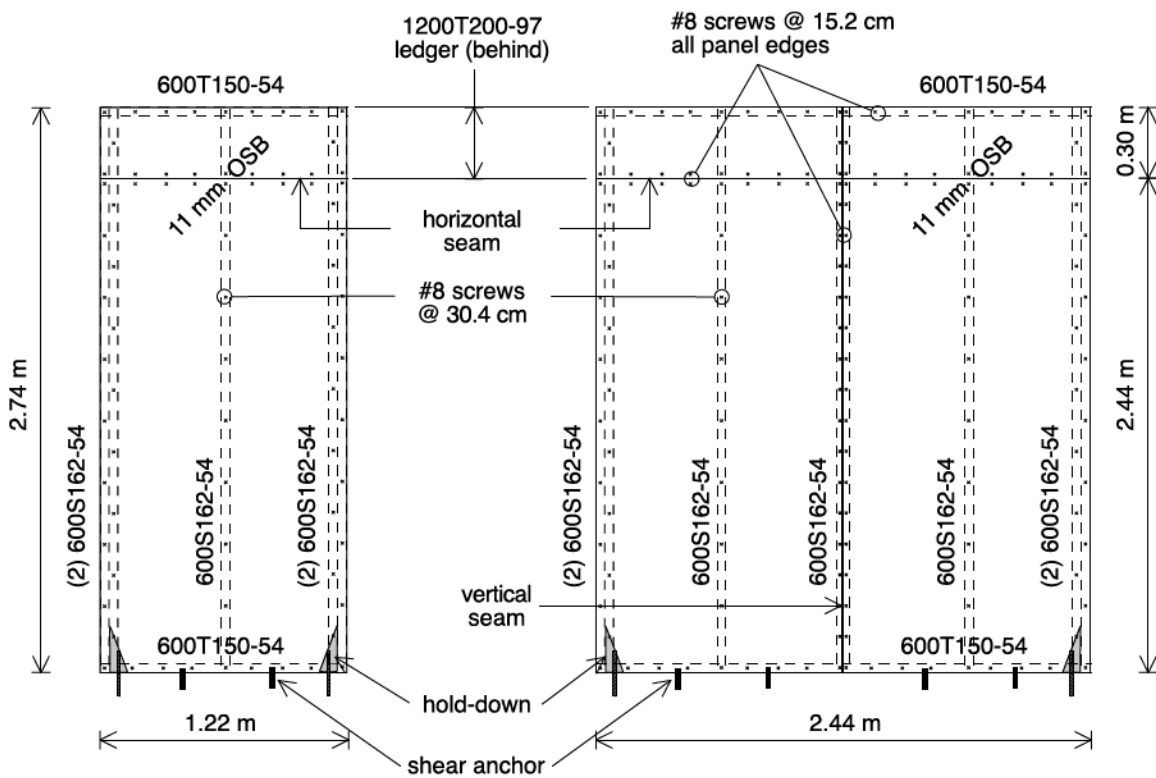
Shear wall configurations for Wall No. 2 (left) and Wall No. 12 (right); other walls are similar.
